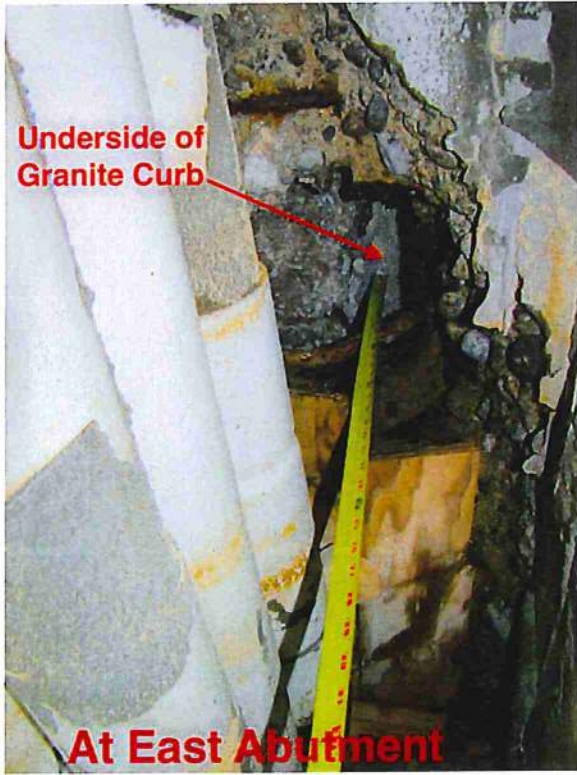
Span 3, bay 1, spall at east abutment extending up to expose bottom of curb
